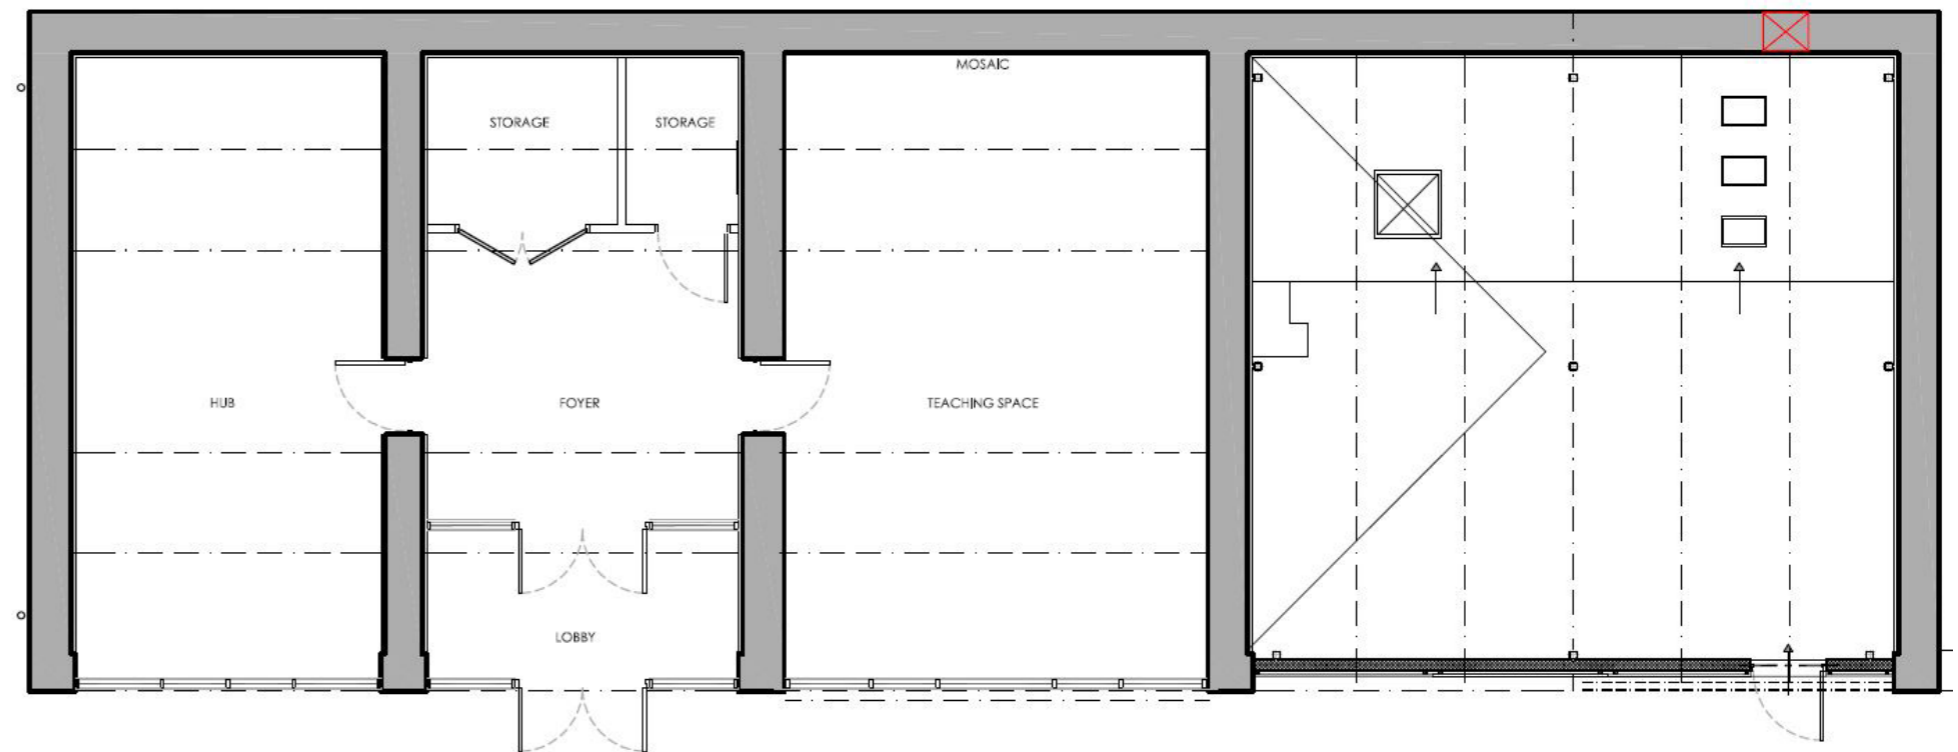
Proposed Floor Plan - dwg. no. 9311-L01
